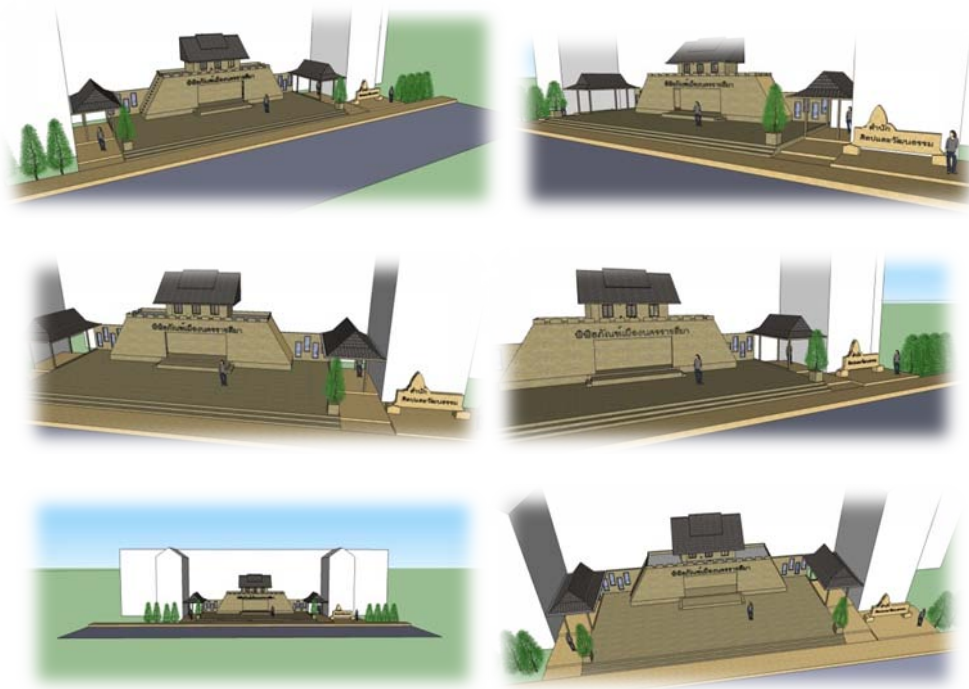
3D sketch of the type A design an outdoor stage after revised.
